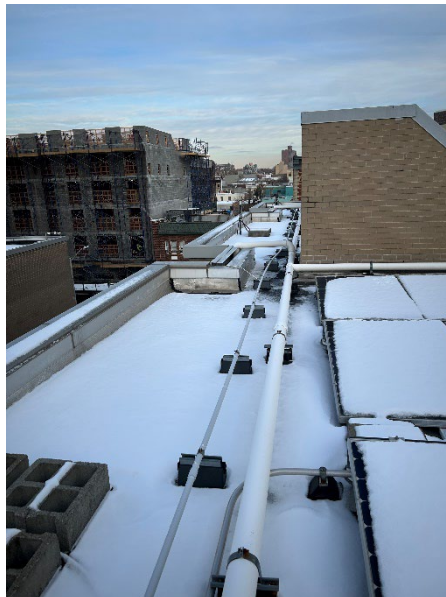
View showing Blower B SSDS piping run along the roof with legs heading down the side of the building.
